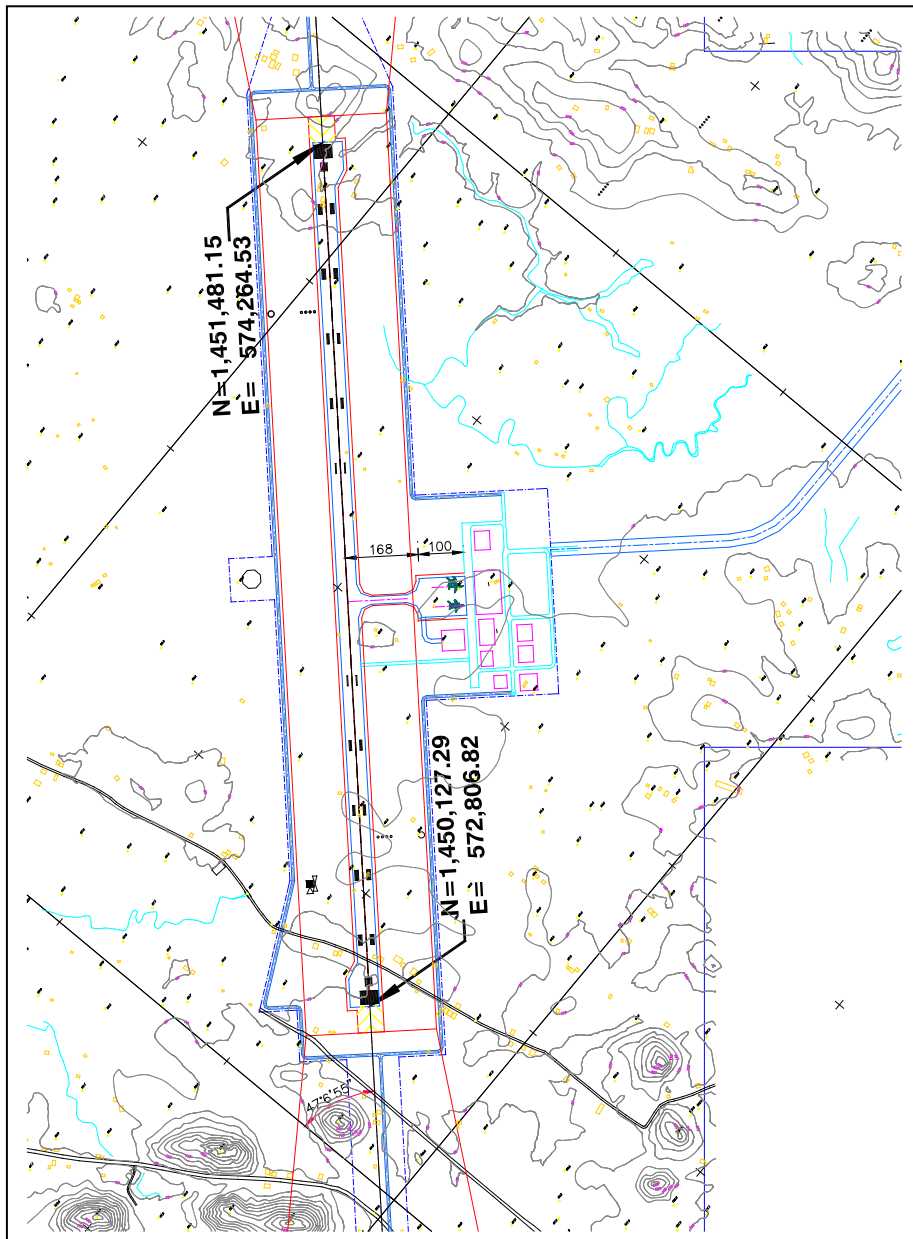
Horizontal Alignment of Airfield Facilities
